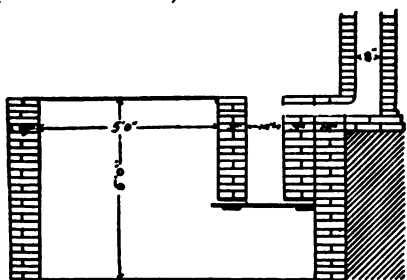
SECTION THROUGH PIT, FURNACE AND CHIMNEY
